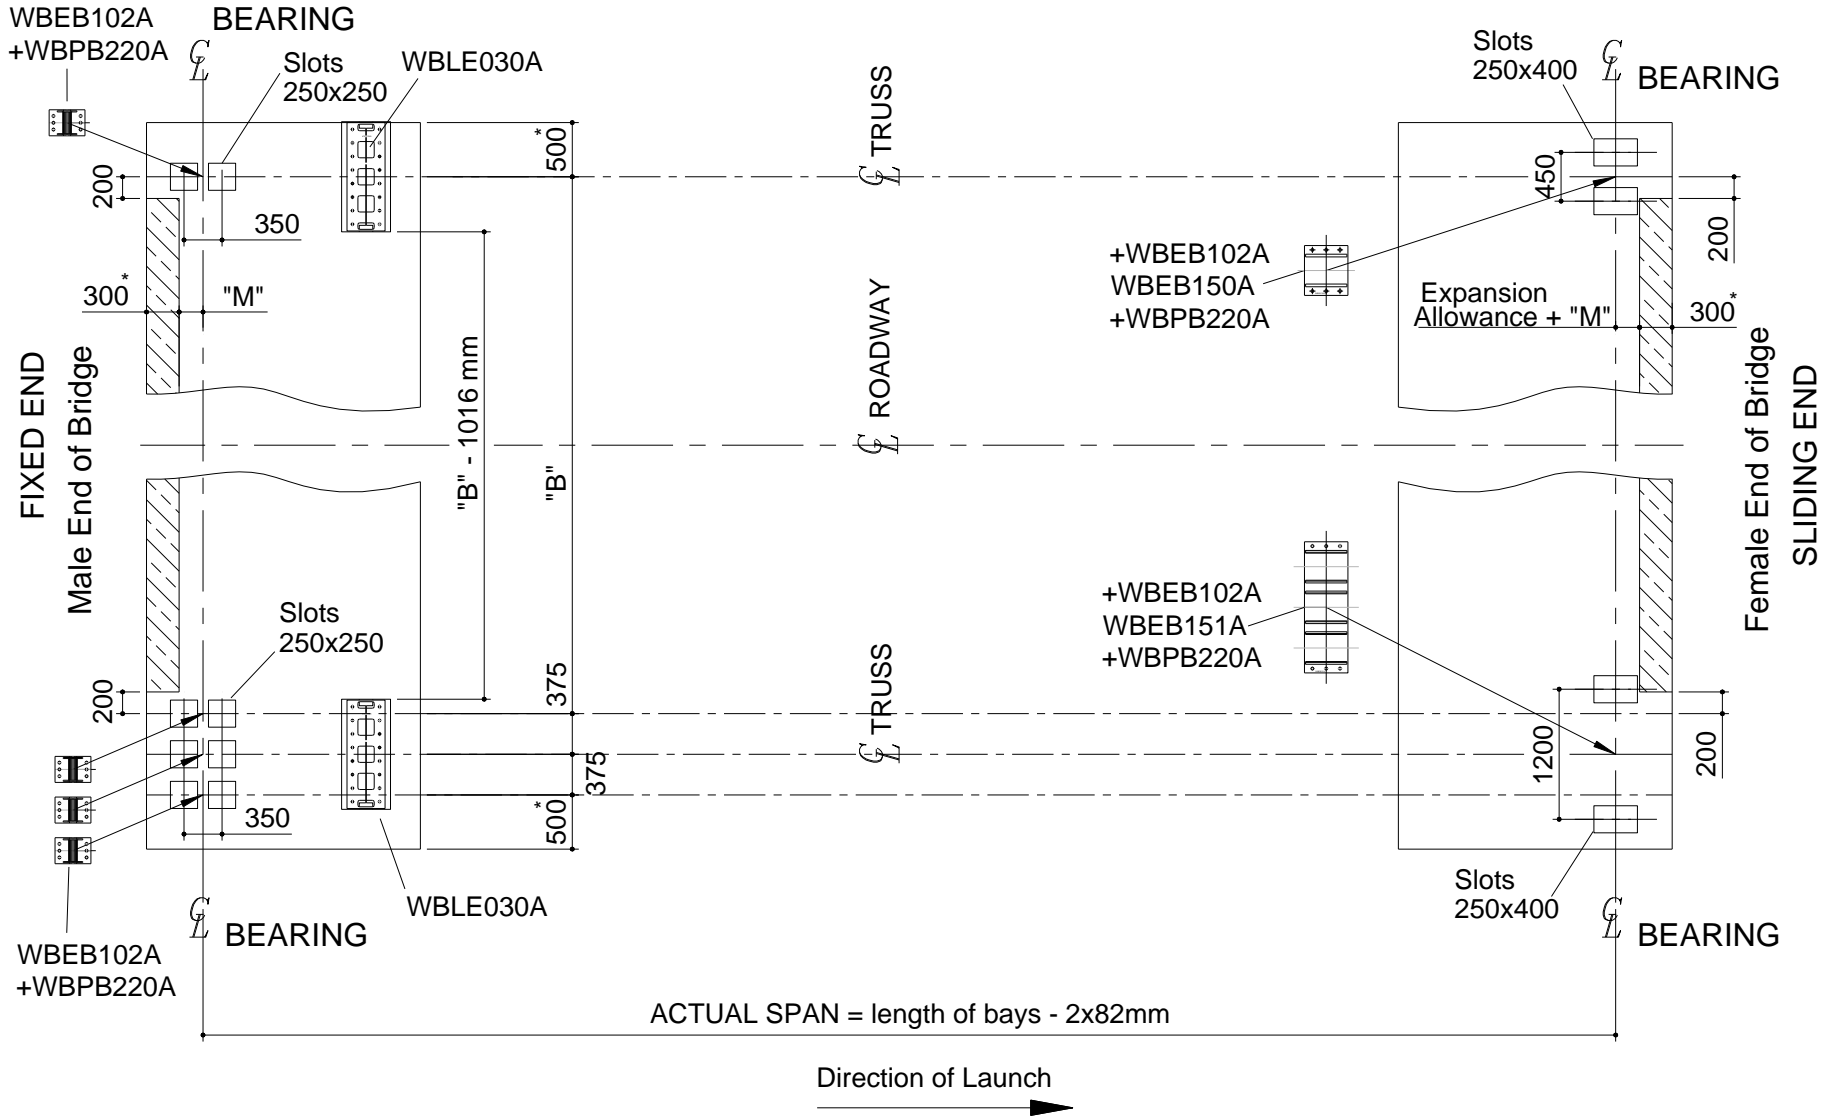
ABUTMENT, BEARING PLATES And Roller Layout for Single span Bridges – Top View
